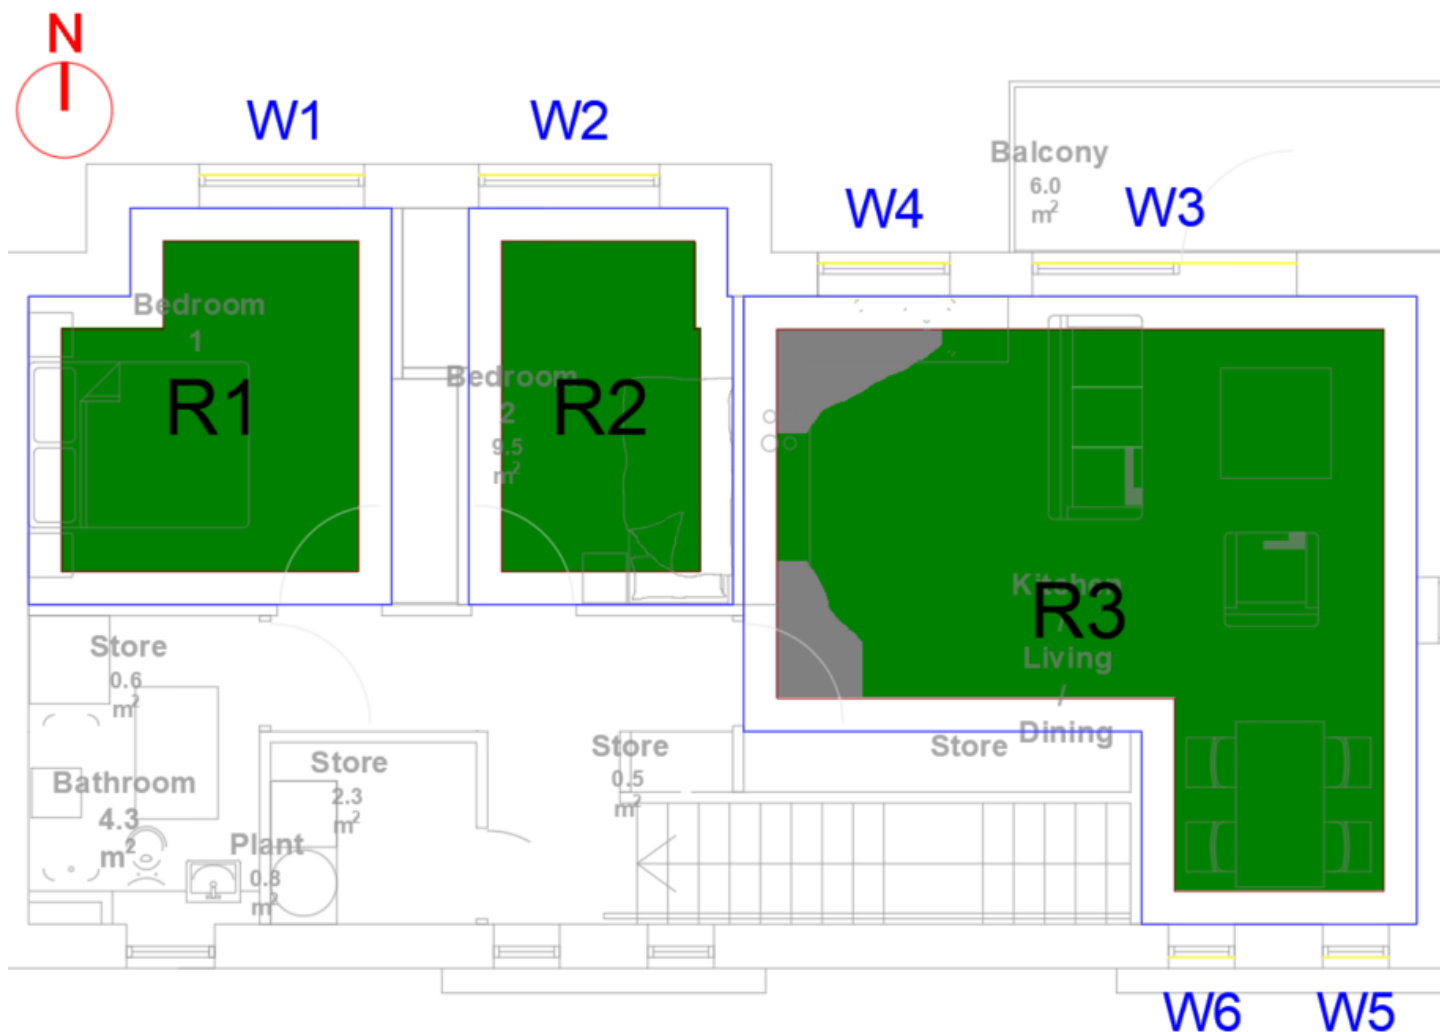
Proposed First Floor sDA Contours of House No.2 Block E (Duplex)
